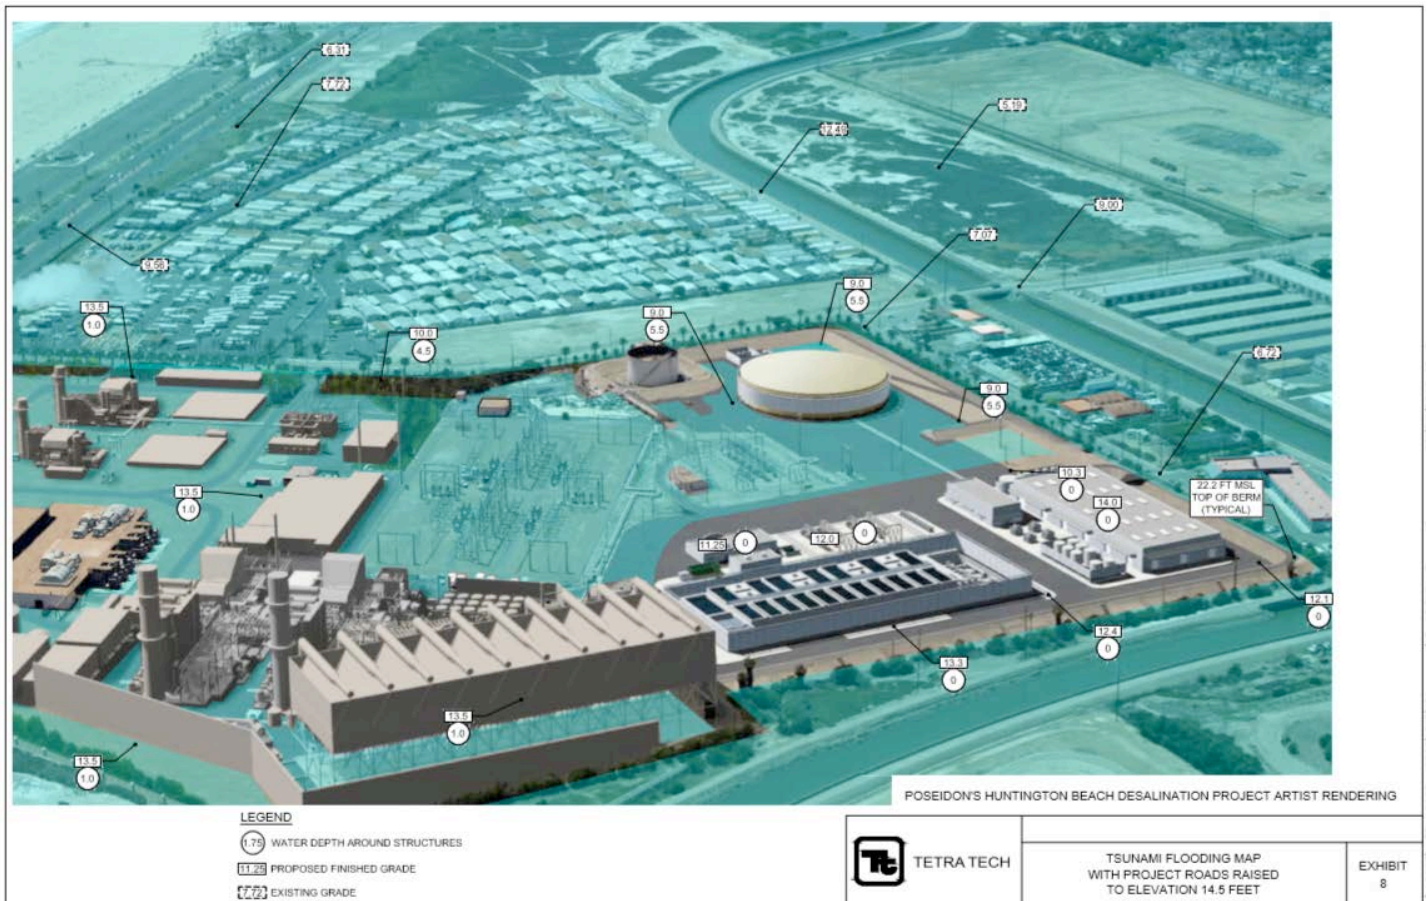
Artistic Rendering of Site Plan with Proposed Regrading and a Tsunami Flood Model Inundation Layer. Tsunami runup elevations were modeled at 11' MSL or 13.6' NAVD88. Inundated areas are shown in blue, with water elevations reaching 5.5' around product water storage tank and structures and up to 12.9' over low-lying neighboring parcels.
